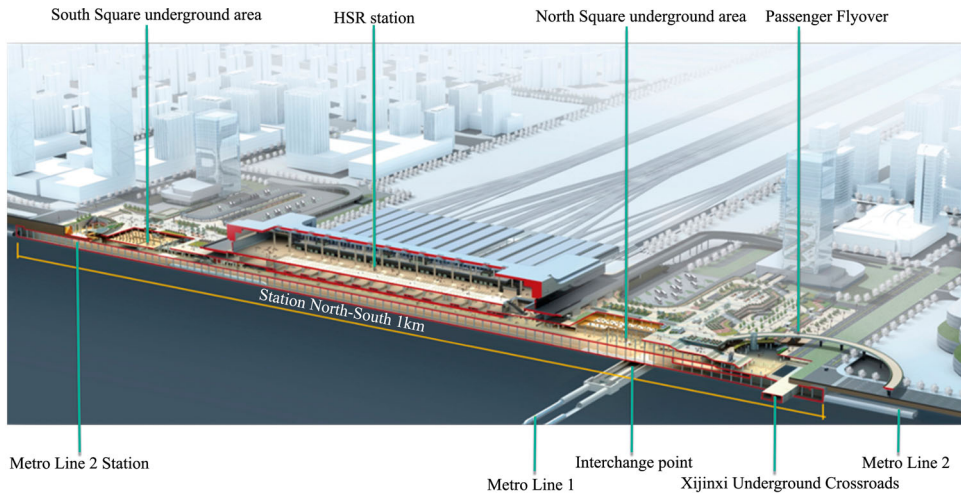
Section map of Lanzhou West HSR station area (Source: adapted from LRTC 2019).
